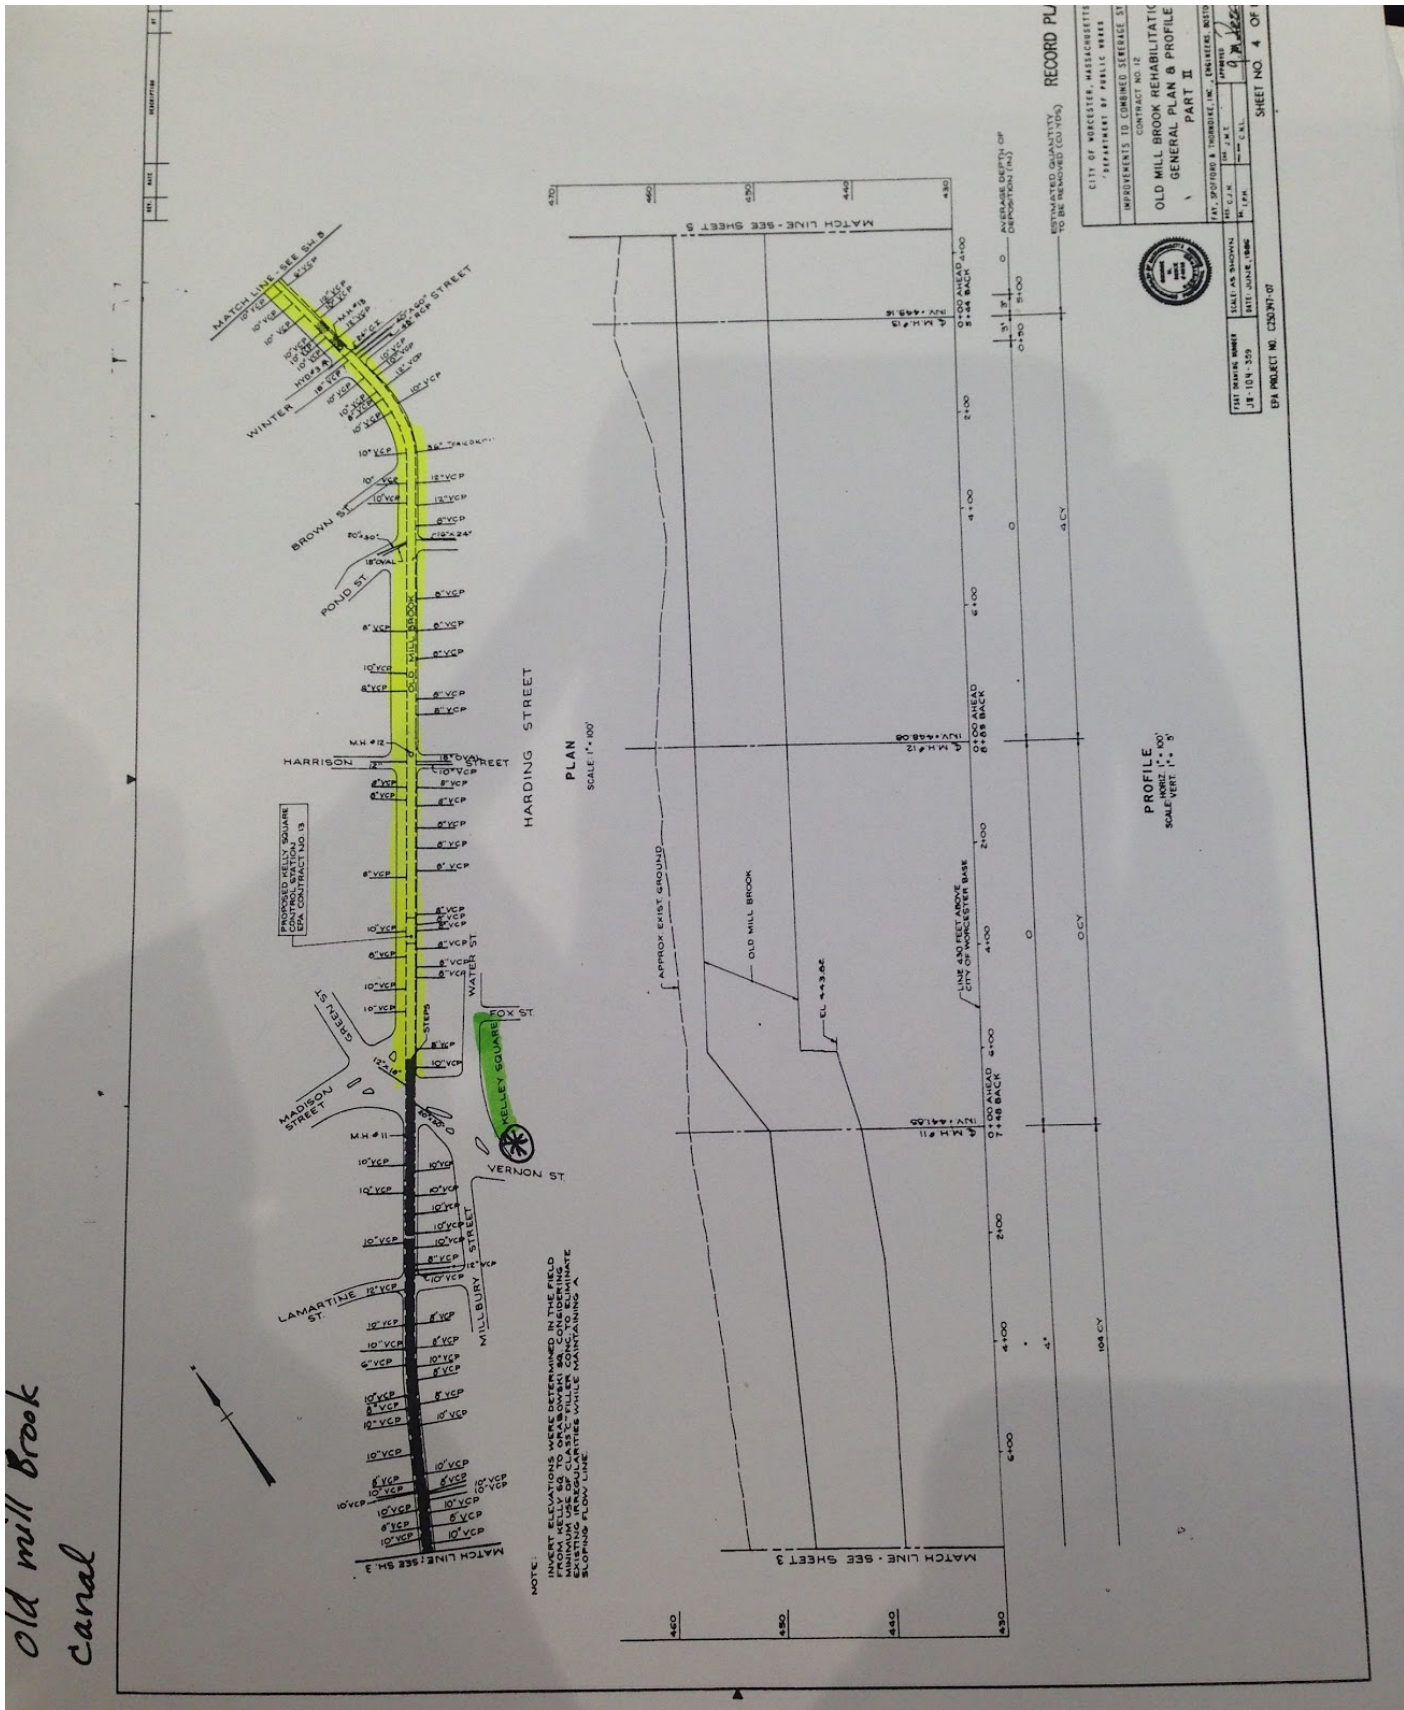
Improvements to Combined Sewerage System Contract No. 12 - General Plan and Profile Part II (Highlighted Canal Segment)
